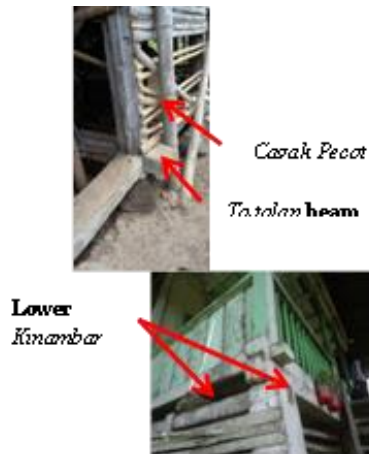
Construction detail of *To'tolan* and *Kinambar* Beams
